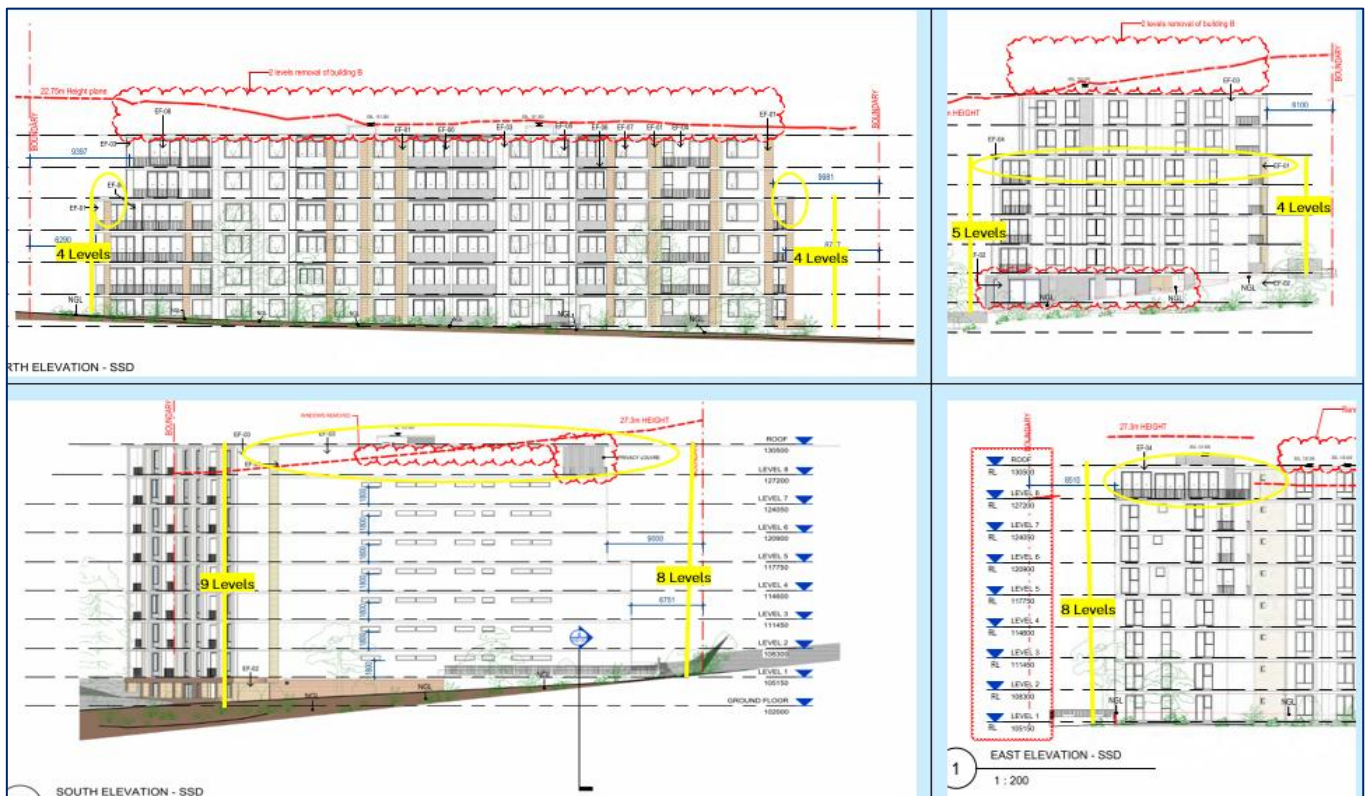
| Northern (left) and eastern (right) elevations of Building B (top) and southern and eastern elevations of Tower A2 in Building A (bottom) (Base source: Architectural Plans)
